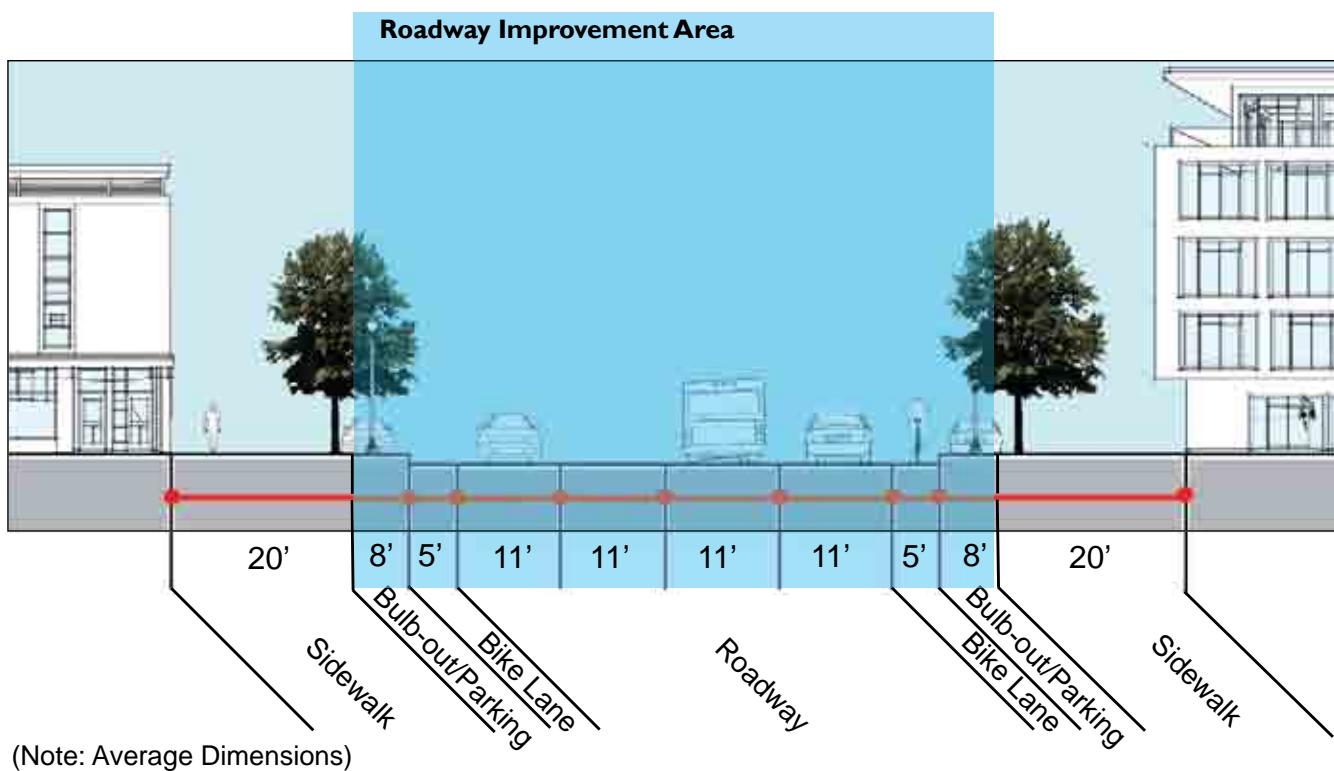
Recommendations - 14th Street NW Section: Roadway Focus
